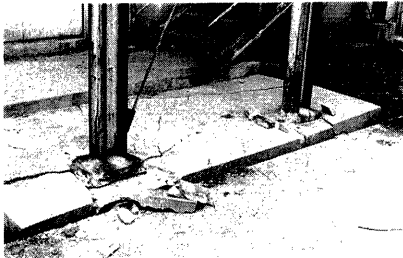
Damage of base of a steel column and end of a steel bar brace (Sendaiminami Senior high school).
